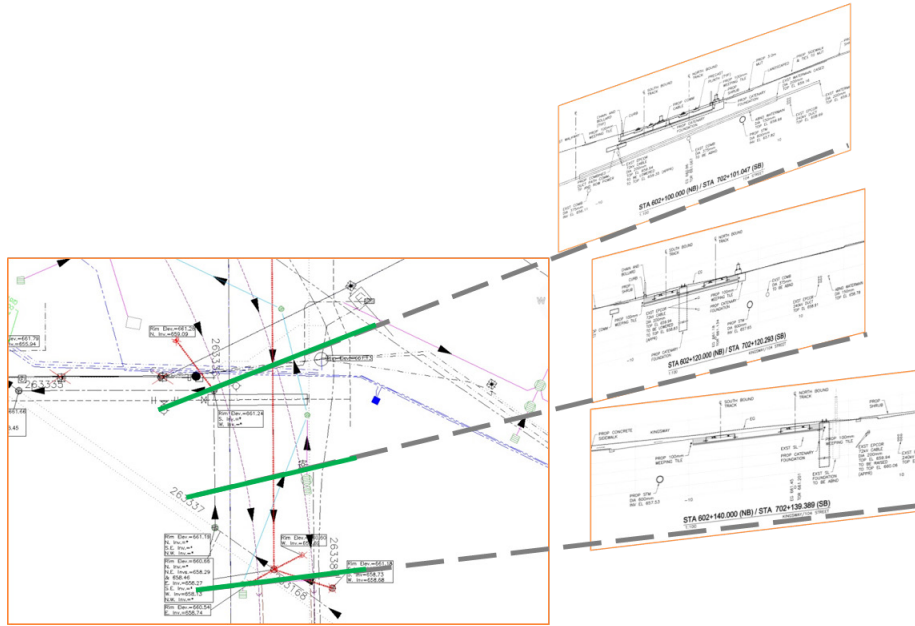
Typical Utility Drawings in Plan and Cross Section View at Kingsway Station
